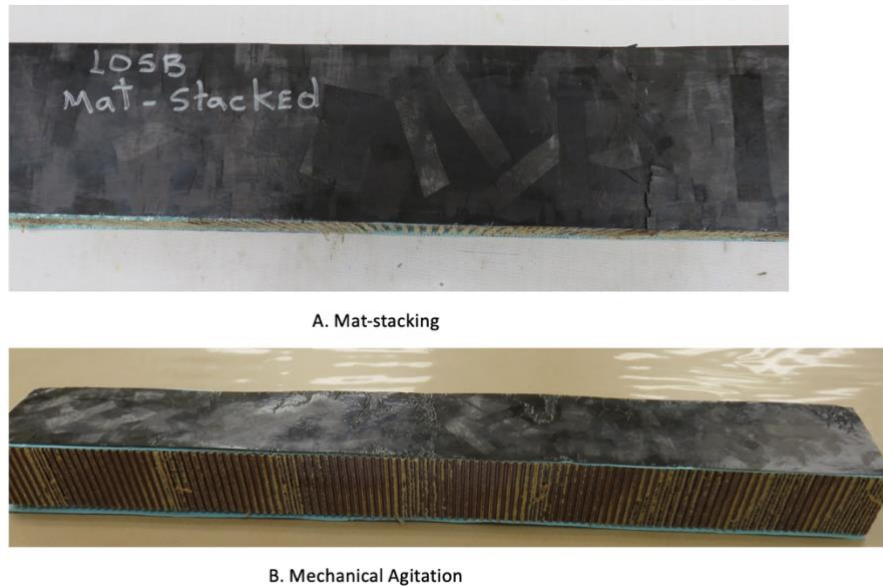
Failure modes. Sandwich beam with mat-stacking COSB face sheets (A), sandwich beam with mechanical-agitation COSB face sheets (B).
